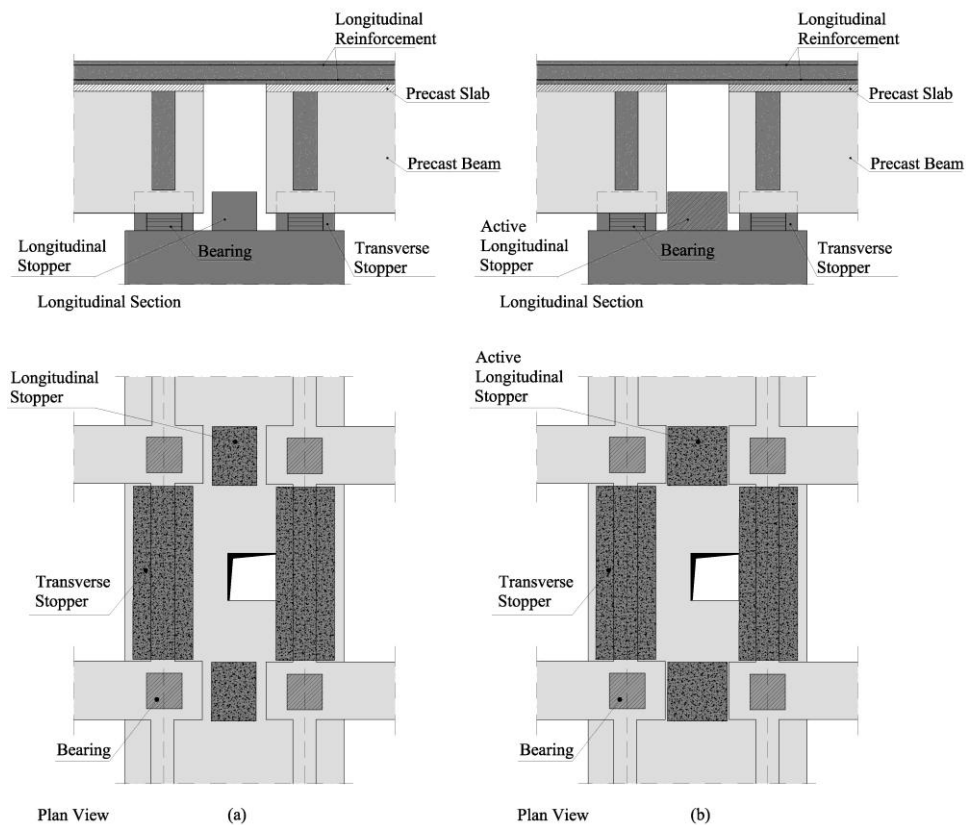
Longitudinal section and plan view of a pier's head with (a) inactive and (b) active longitudinal seismic stoppers
